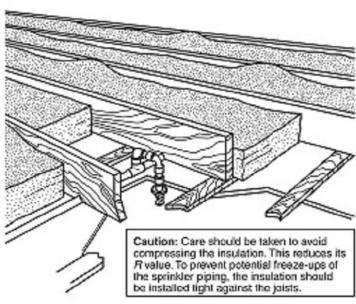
(e) Insulation Recommendations — Arrangement 5.
